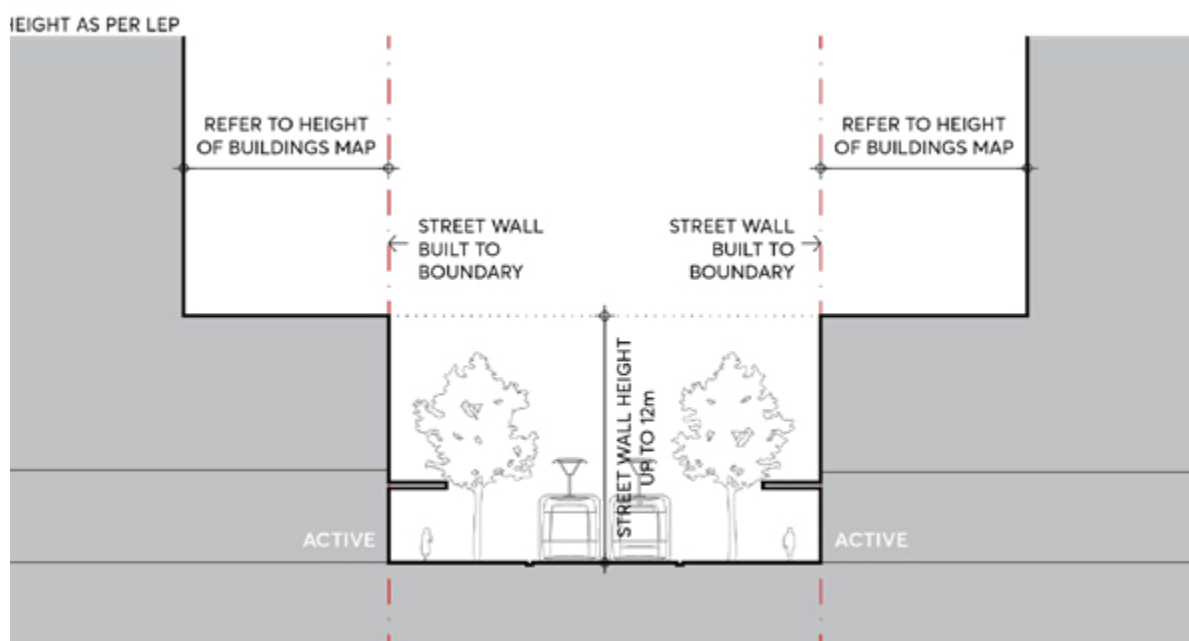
Church Street - Street Setbacks and Street Wall Height
